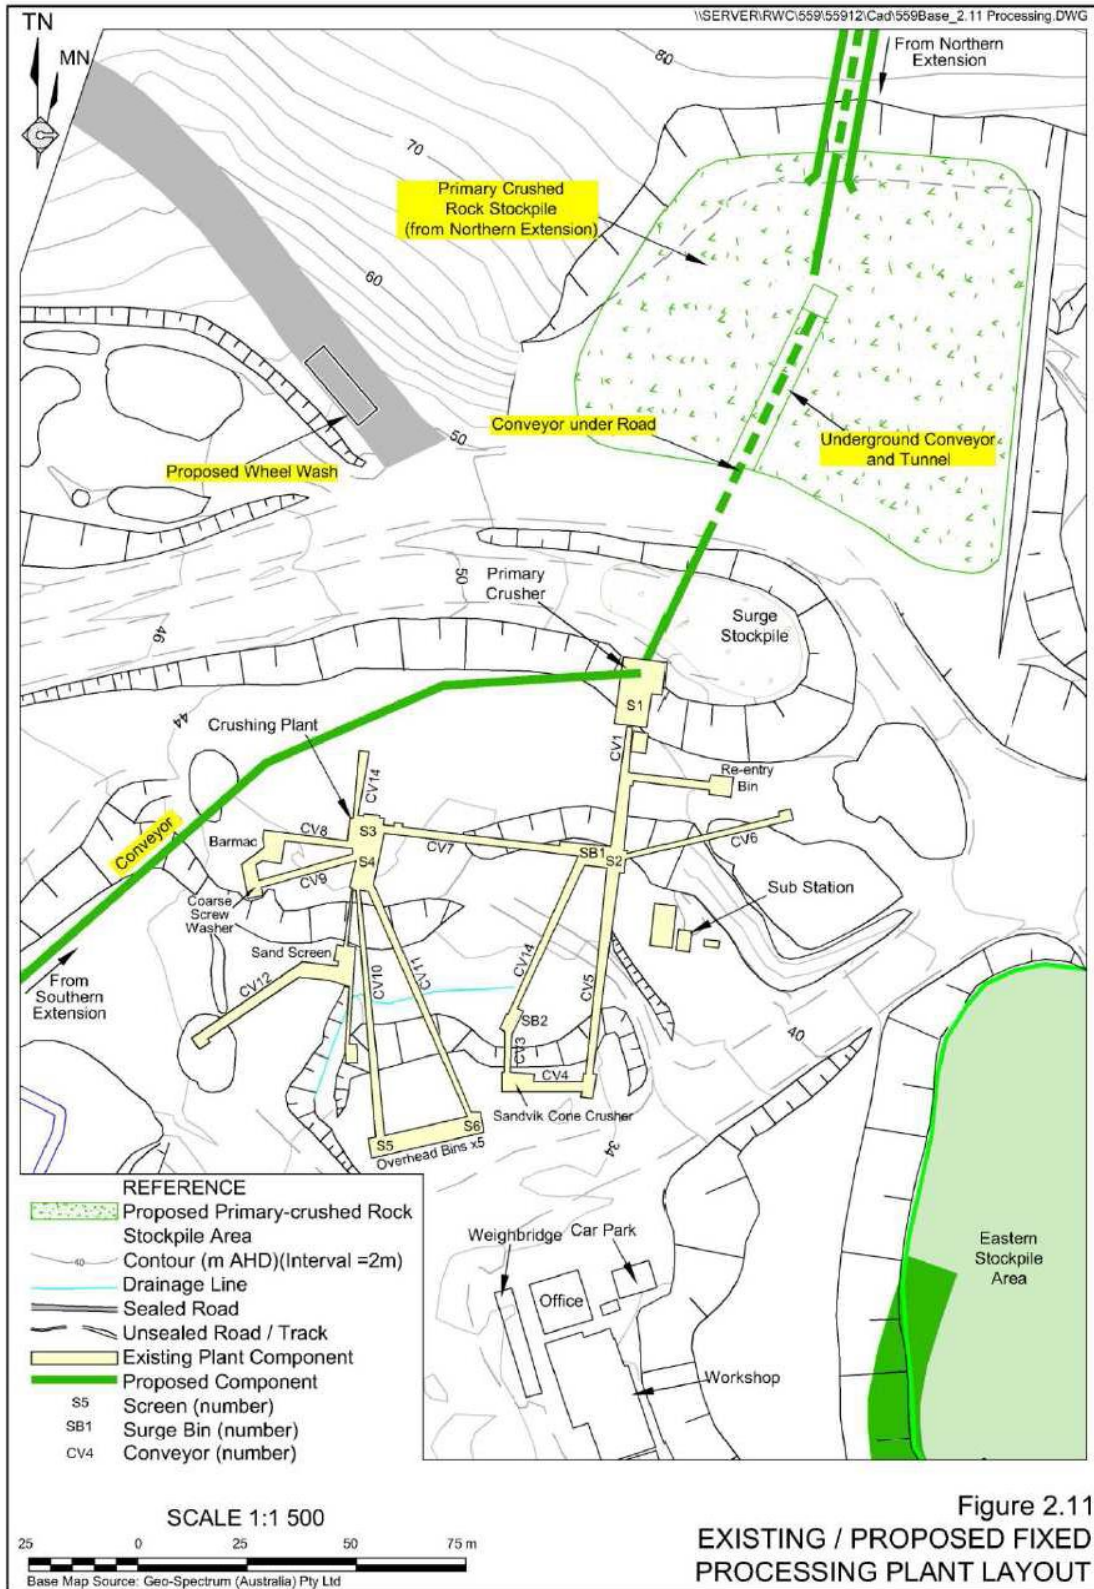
Existing / Proposed Fixed Processing Plant Layout
